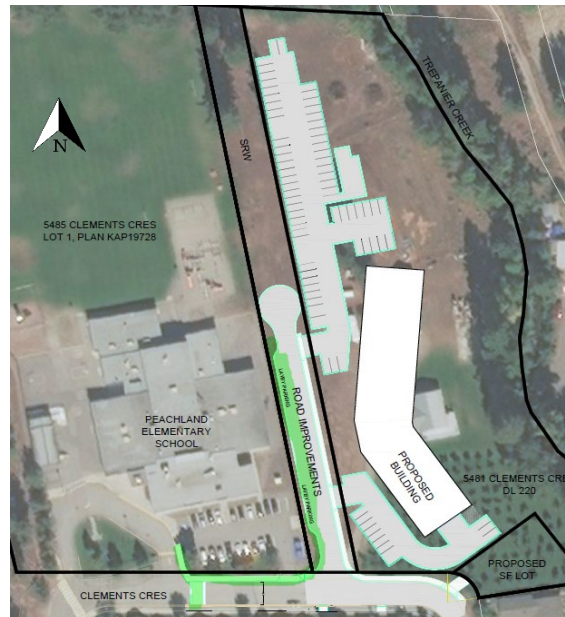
Proposed Road Improvements (offsite works highlighted in green)
